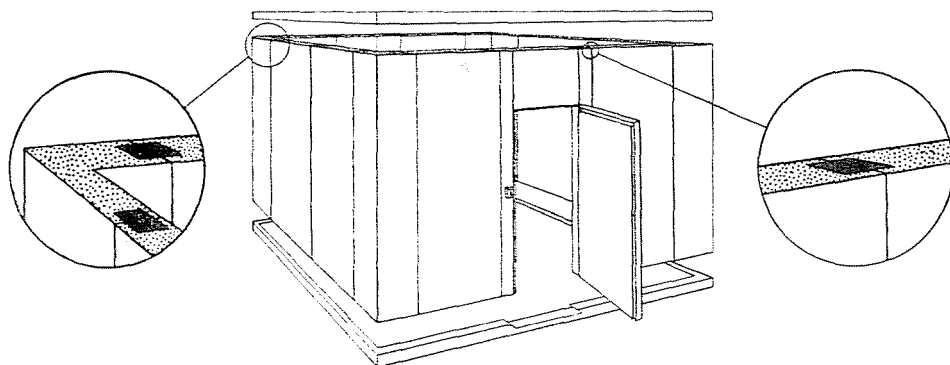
Construction and joints of a refrigerating chamber system Tyler. By courtesy Refrigerator Factory, Jászberény
